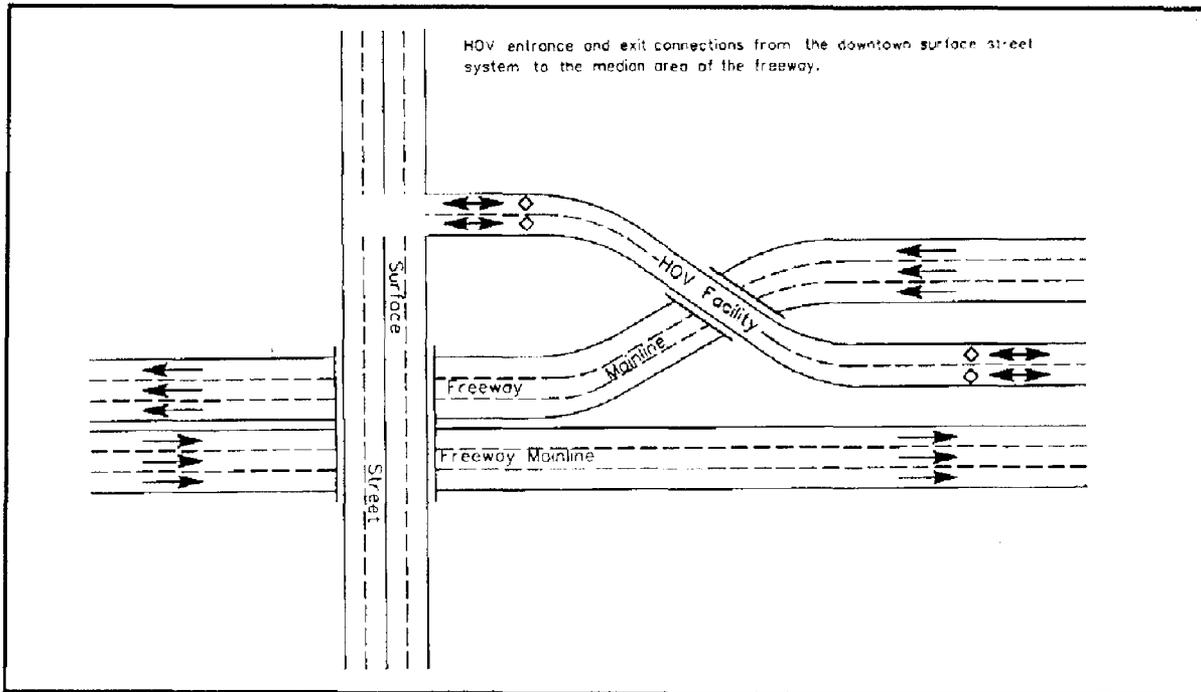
Terminal Flyover Connection to Surface Street System.⁽¹⁰⁾
